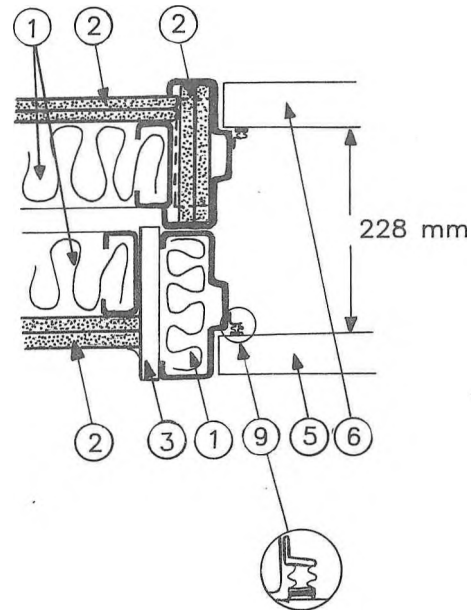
Cross section sketch showing installation of the double doorframe in the partition. Door separation is 228 mm.
